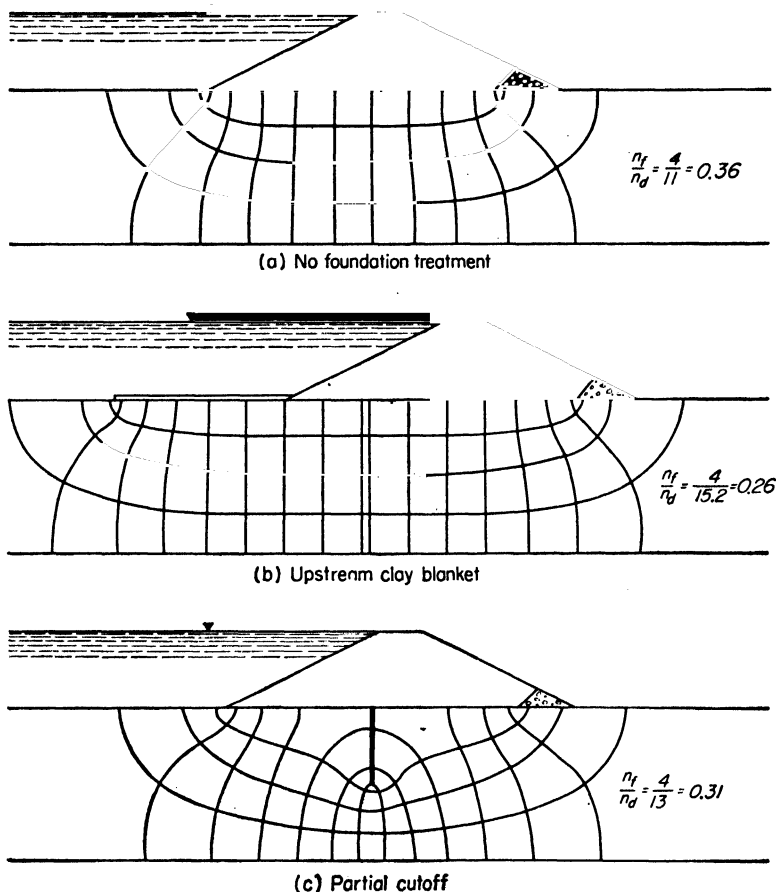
Effect of foundation treatments on flow through pervious foundation.
